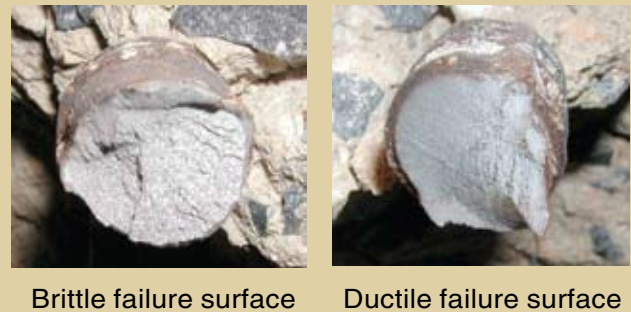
Fracture of the slug weld initiated a brittle fracture in the left anchorage bar followed by a ductile fracture in the right anchorage bar.
